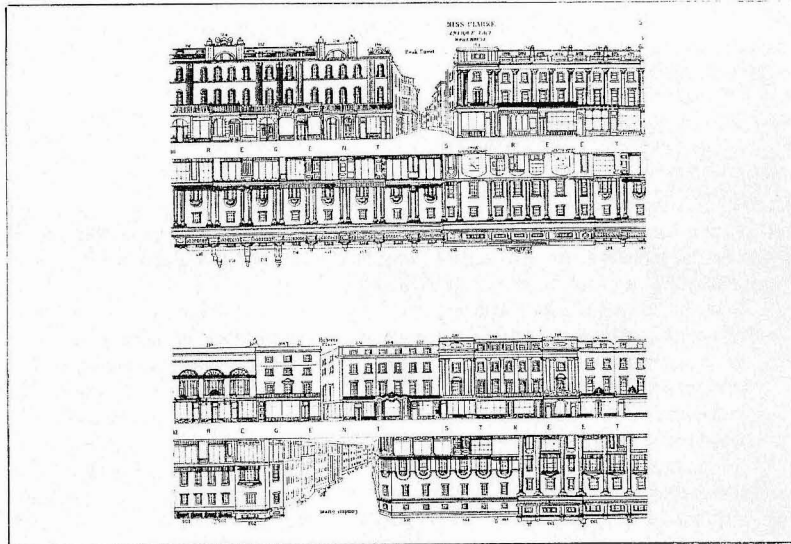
Street elevations to Regent Street, London, from Tallis's Street Views and Pictorial Directory etc. (1847).
